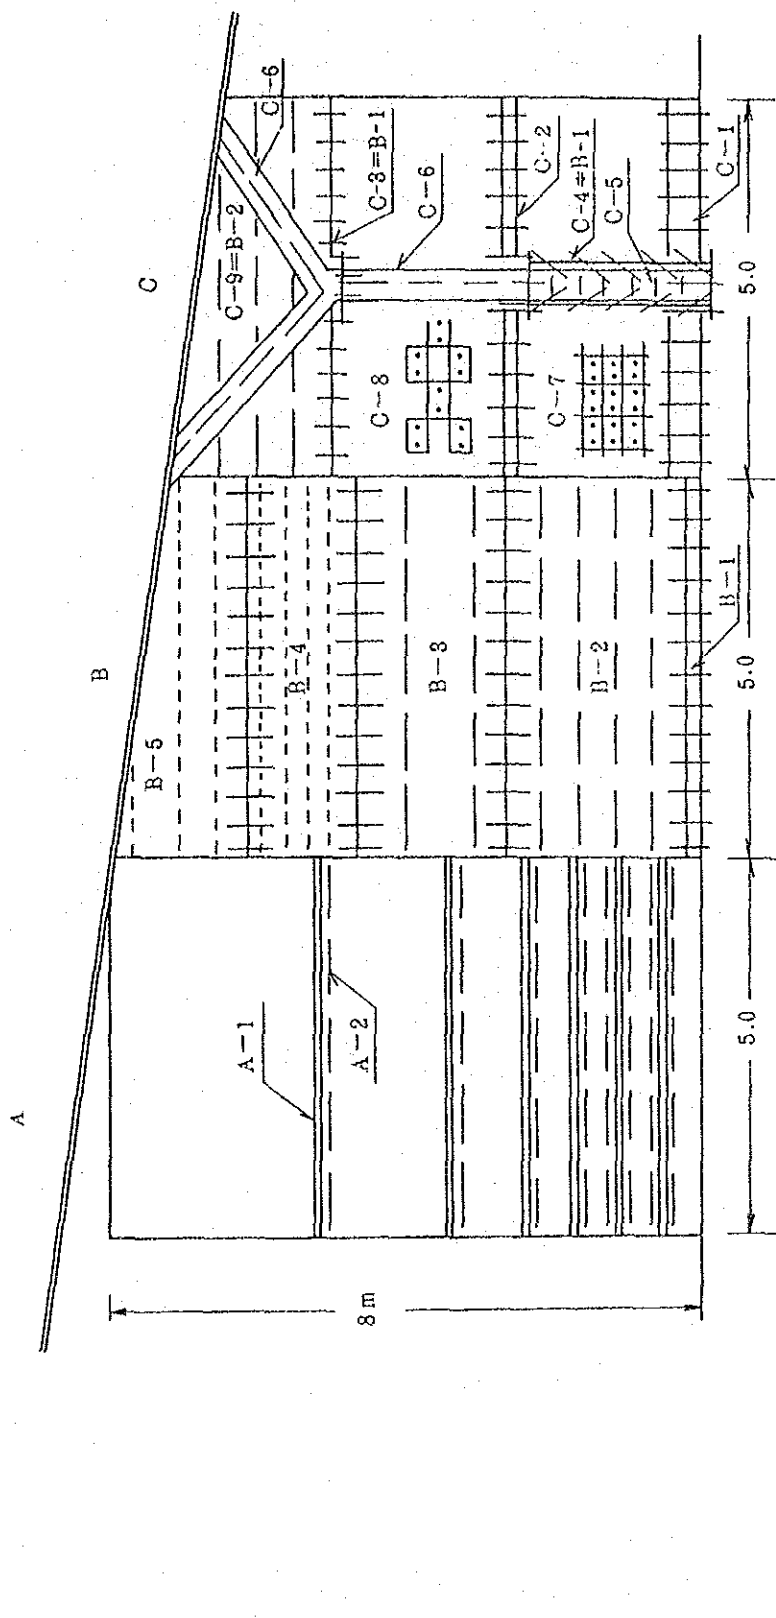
Plan view of executing simple soil conservation works (1983)
